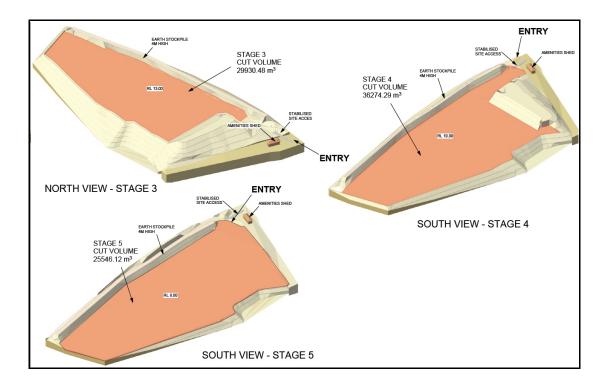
Extract from the 3D model of Stages 3, 4 & 5. Full details are provided on Drawing No.21, Issue E of the plans of the proposed development at Appendix 9.
